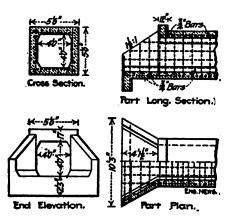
REINFORCED CONCRETE BOX CULVERT, GREAT NORTHERN RAILWAY.
